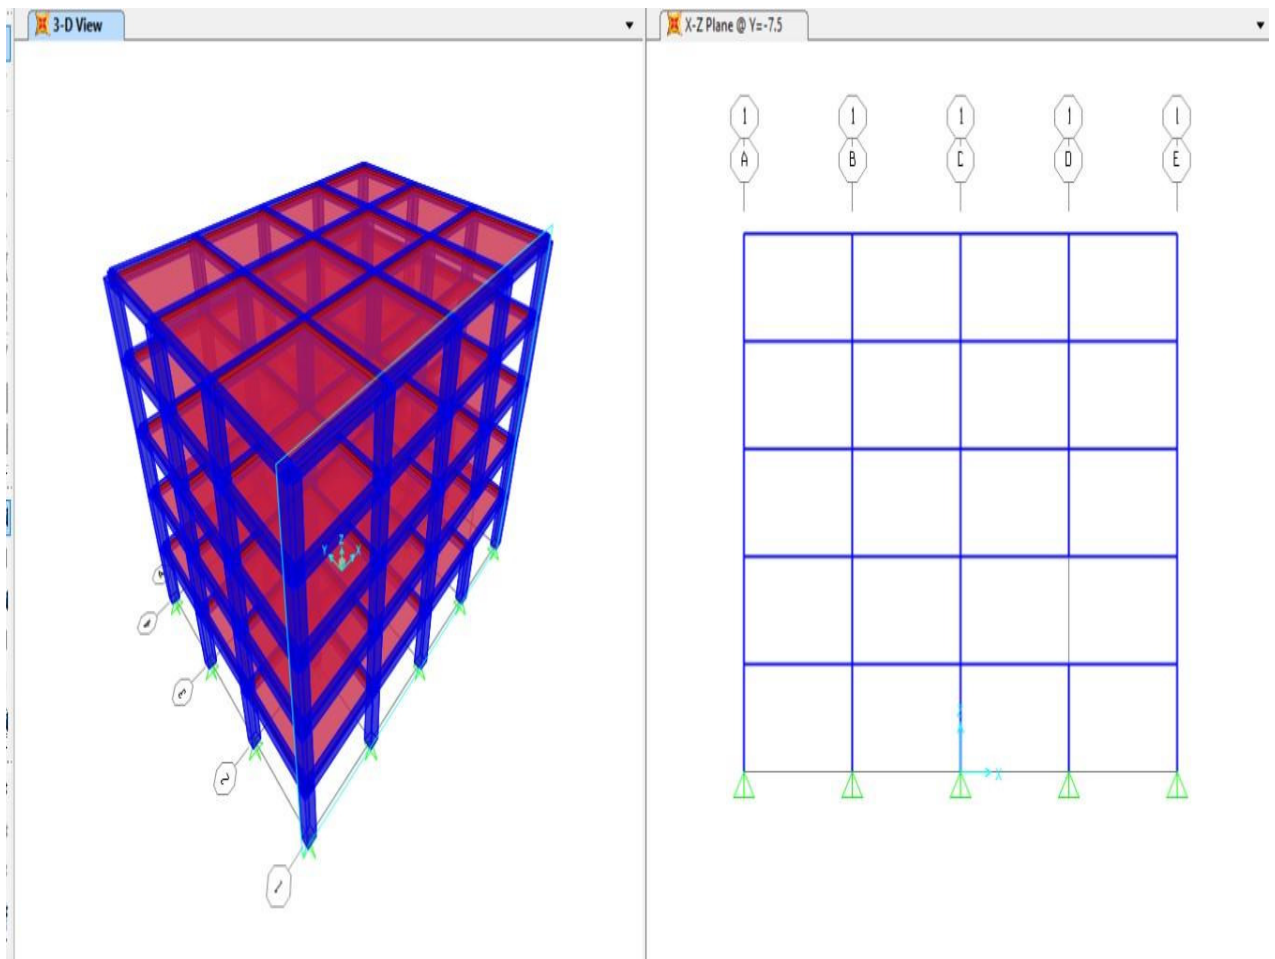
Extruded 3D view of model showing floating column at 1st floor
